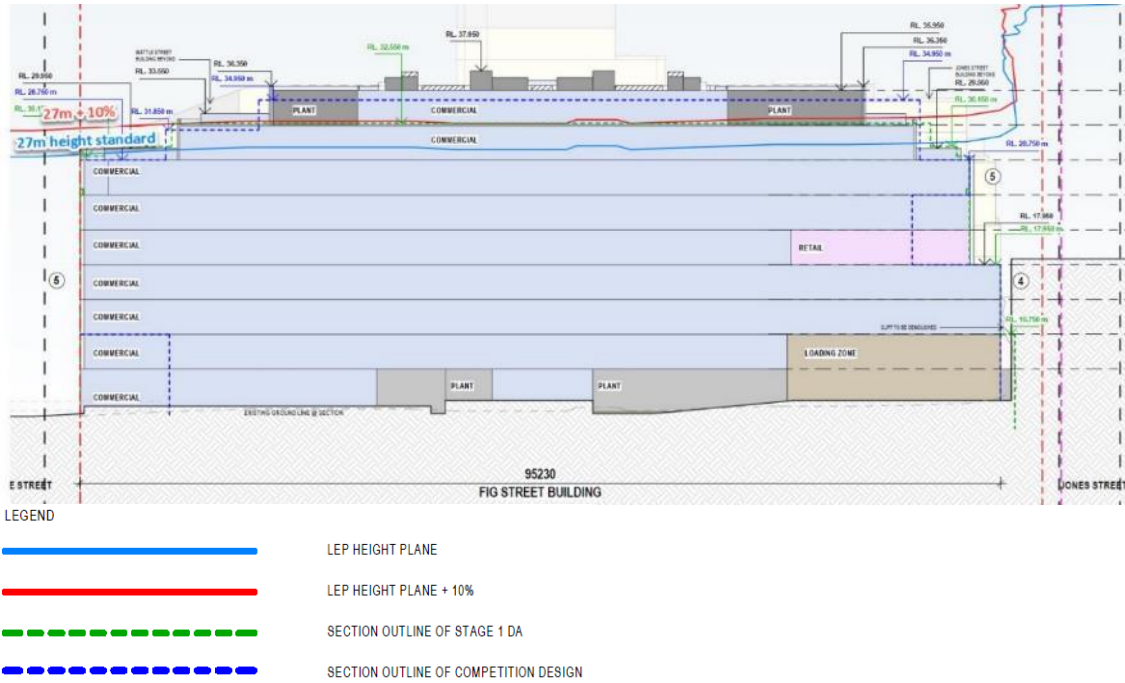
Building E - Fig Street Section: Proposed/modified building envelope
